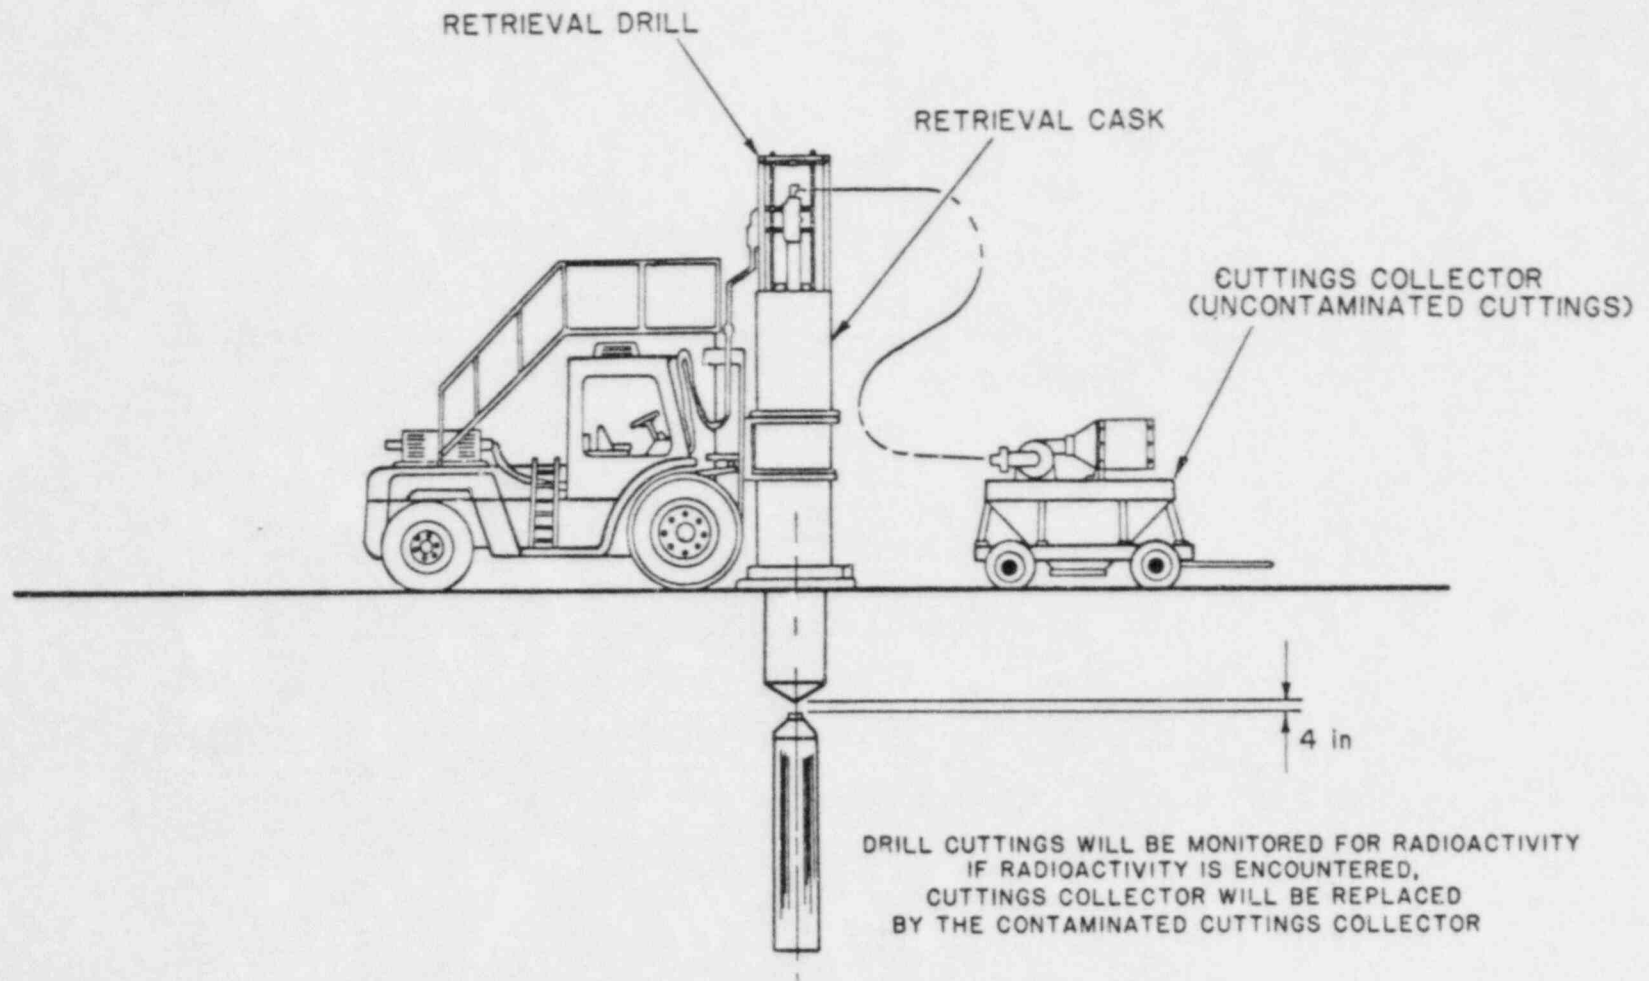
Overcoring apparatus blind drilling above canister.
